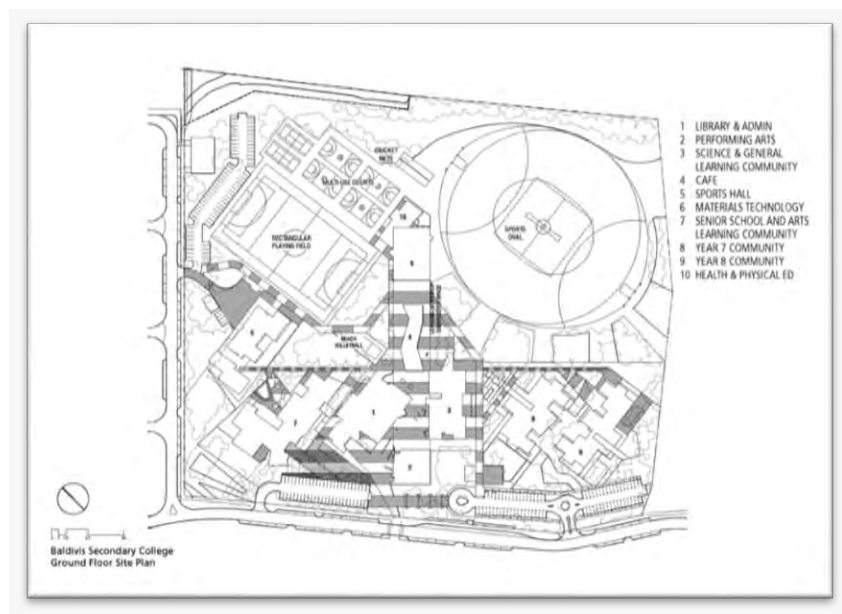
Ground floor plan. Source: "Baldvis Secondary College / JCY Architects and Urban Designers" 06 Aug 2015. ArchDaily. Accessed 3 Oct 2018.
